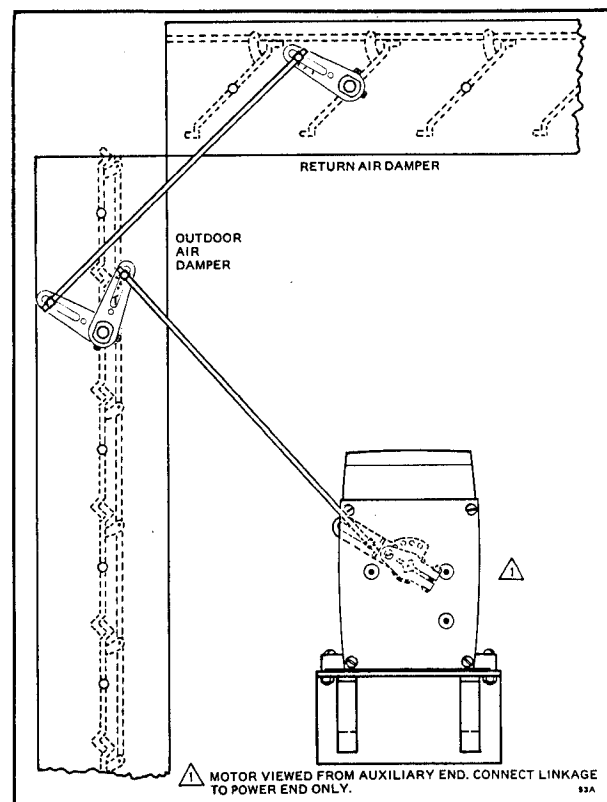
MODUTROL MOTOR MOUNTED EXTERNALLY ON THE DUCT TO CONTROL TWO DAMPERS ACTING AT RIGHT ANGLES.
